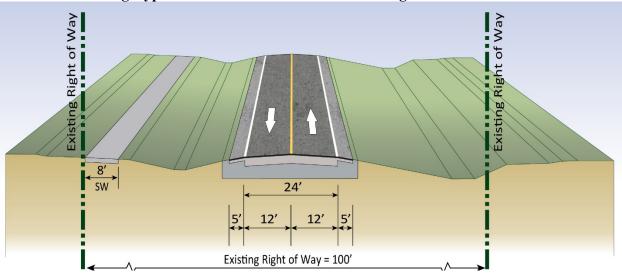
SR 29 Existing Typical Section from Seminole Crossing Trail to New Market Road
